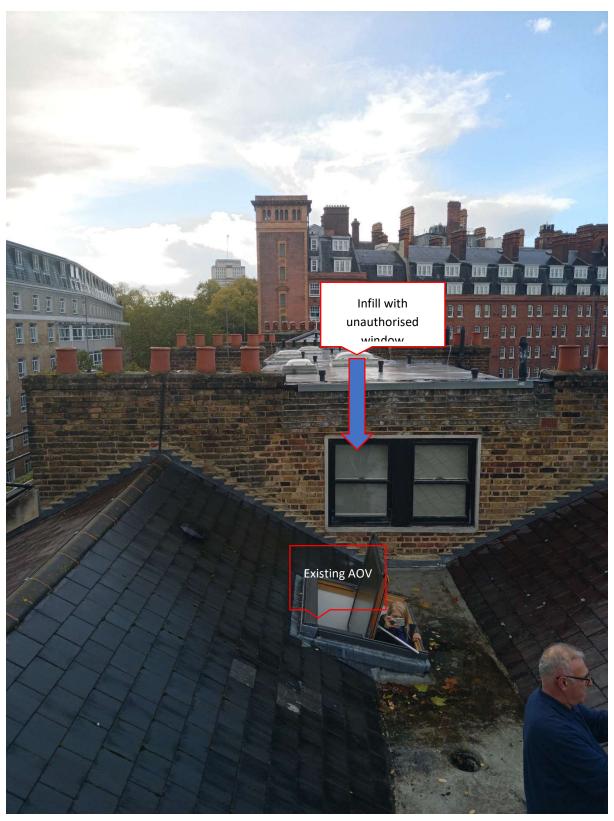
Roof on number 70, looking towards number 69 with a new flat roof at the apex.
